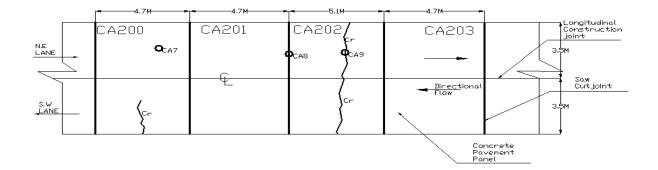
Cracking patterns in the experimental pavement
